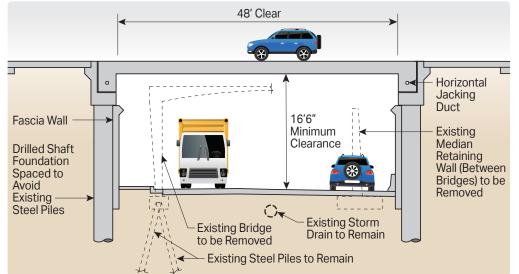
| TYPICAL BRIDGE REPLACEMENT
